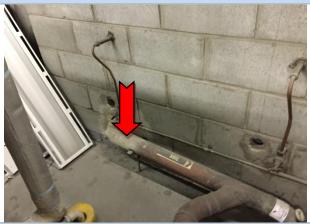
Interior: levels 1, 3, 5 and 6, plant room, pipe work – asbestos containing fire stop membrane.
